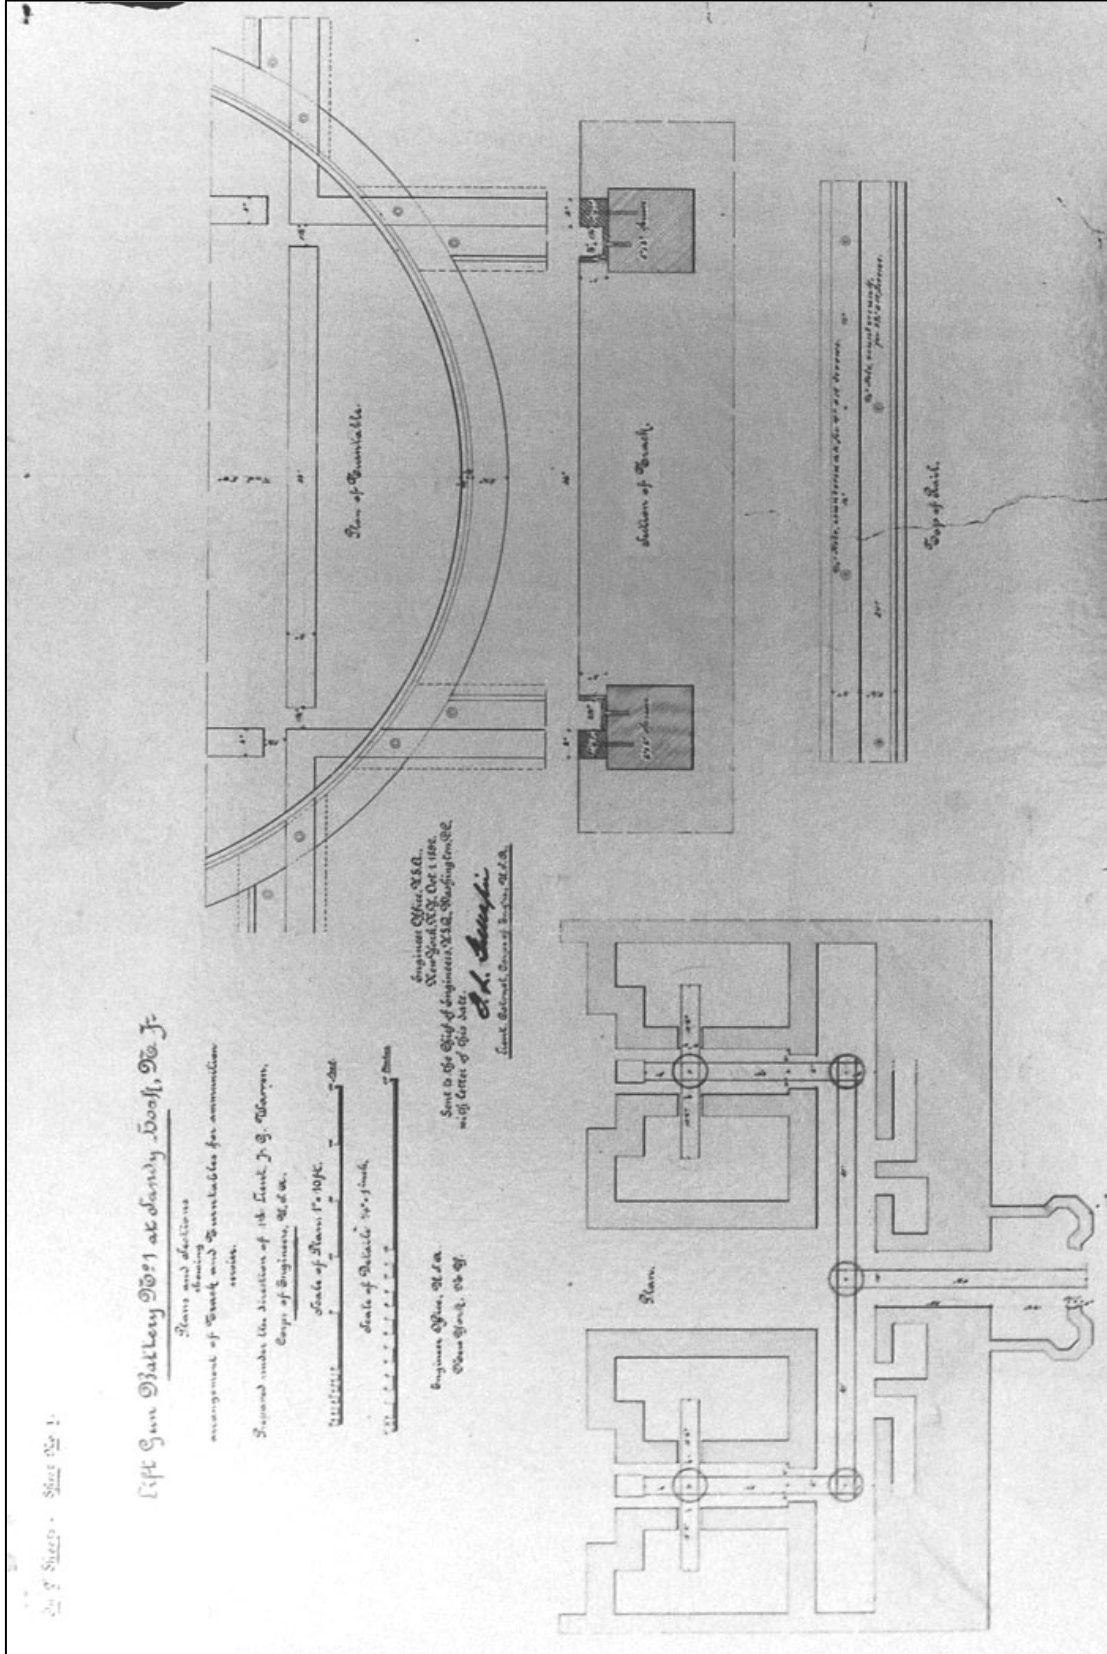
"Lift Gun Battery No. 1 at Sandy Hook, N.J. Plans and sections showing arrangement of track and turntables for ammunition service." Prepared under the direction of 1st Lt. J.G. Warren, Corps of Engineers, Oct. 1, 1892.
